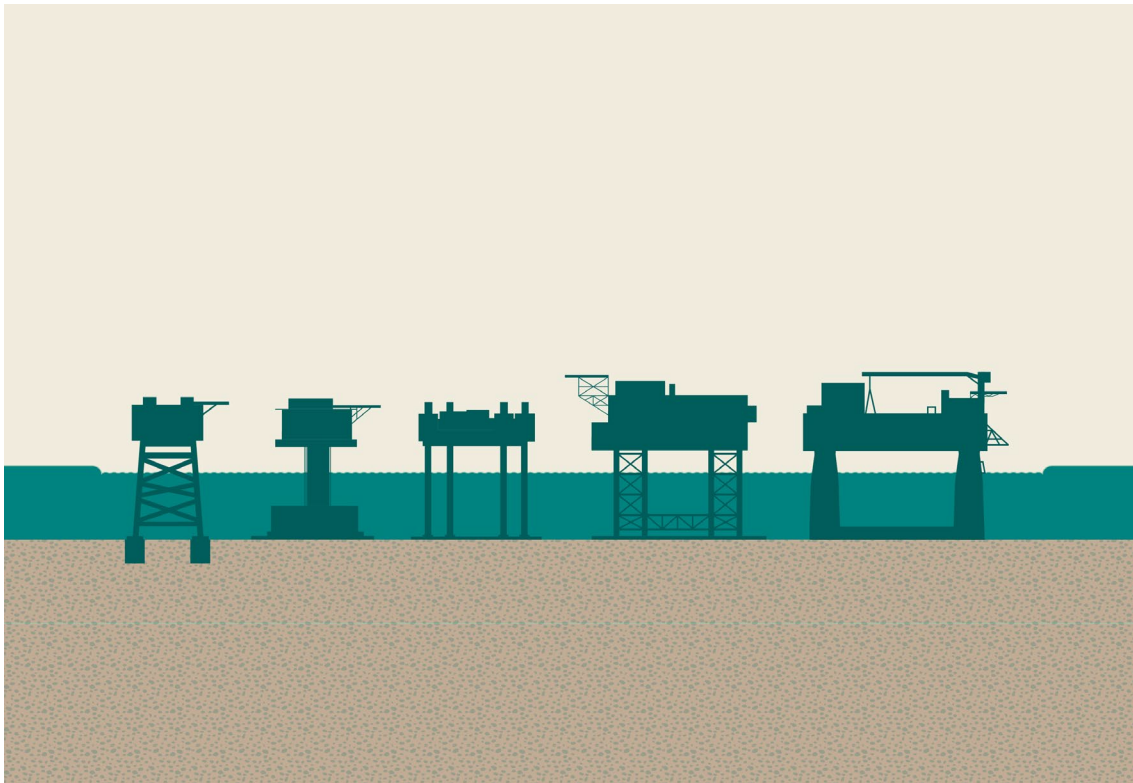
Examples of offshore high voltage platforms with associated foundations. From left: jacket foundation, gravity foundation, outrigger foundation, jacket foundation (with float-over installation), self-installing gravity foundation [Illustration: OX2 AB 2023].
